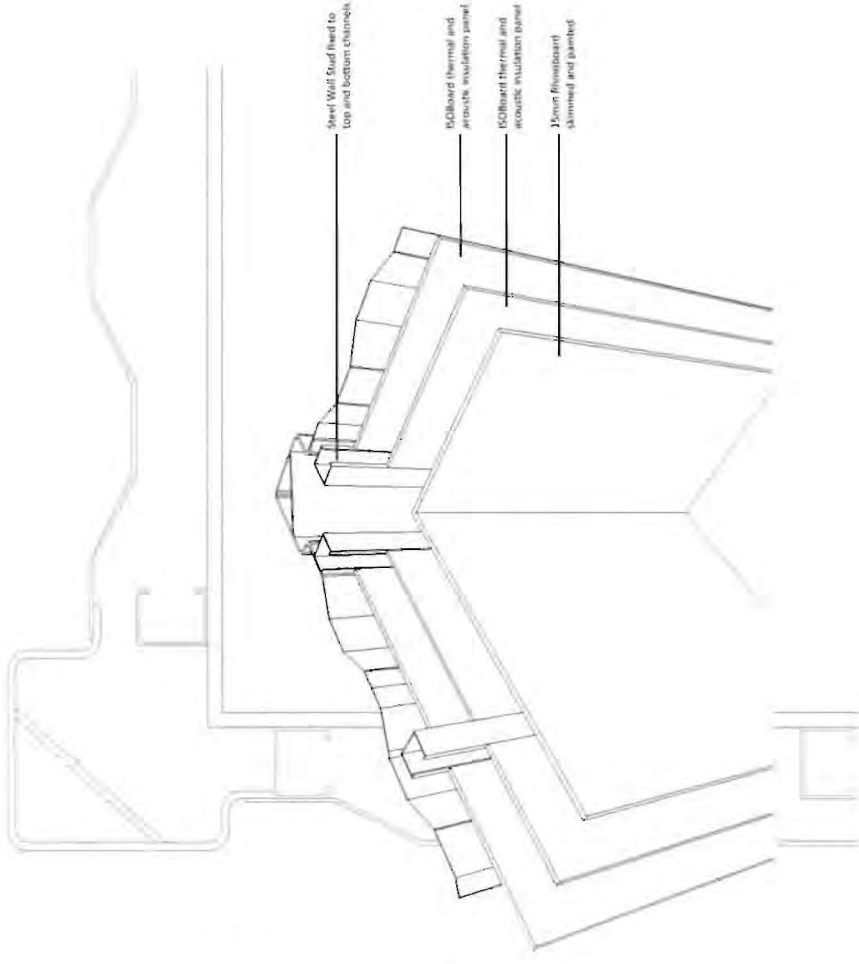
Diagram illustrating an approach to insulating the steel box. A 75mm think typical drywall construction with the addition of thermal and acoustic insulation panels in the drywall cavity. An additional thermal layer can be added in the cavity between the insulation panels if necessary. Image by author.
